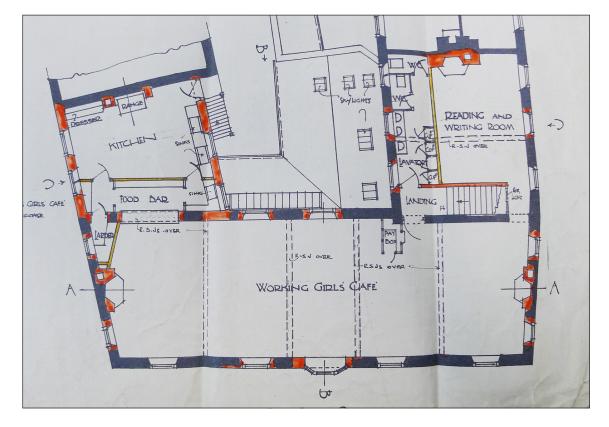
First-floor plan of the Pheasant, Church Street, Carlisle, drawn in 1916 (CACC Ca/E6/1/7 Reproduced under the Open Government Licence)
